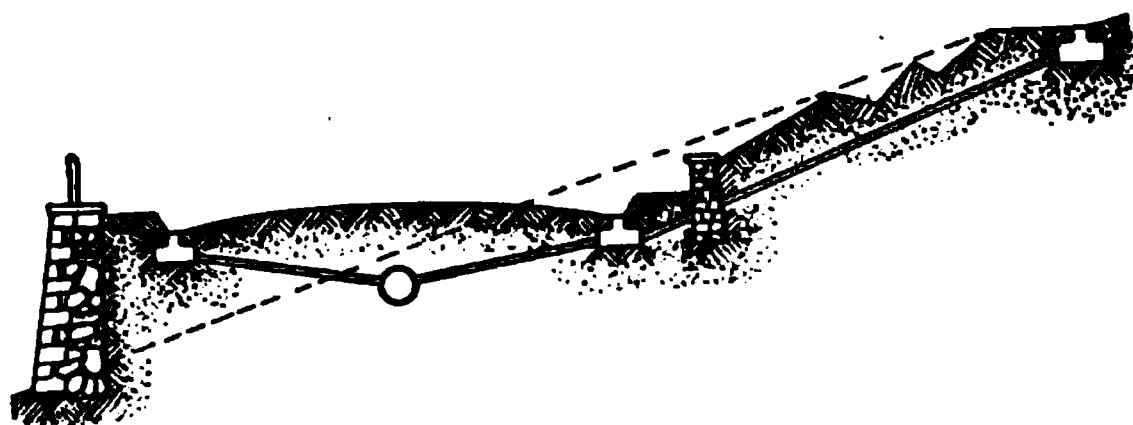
Method of Construction on Slopes, using Retaining Walls.
